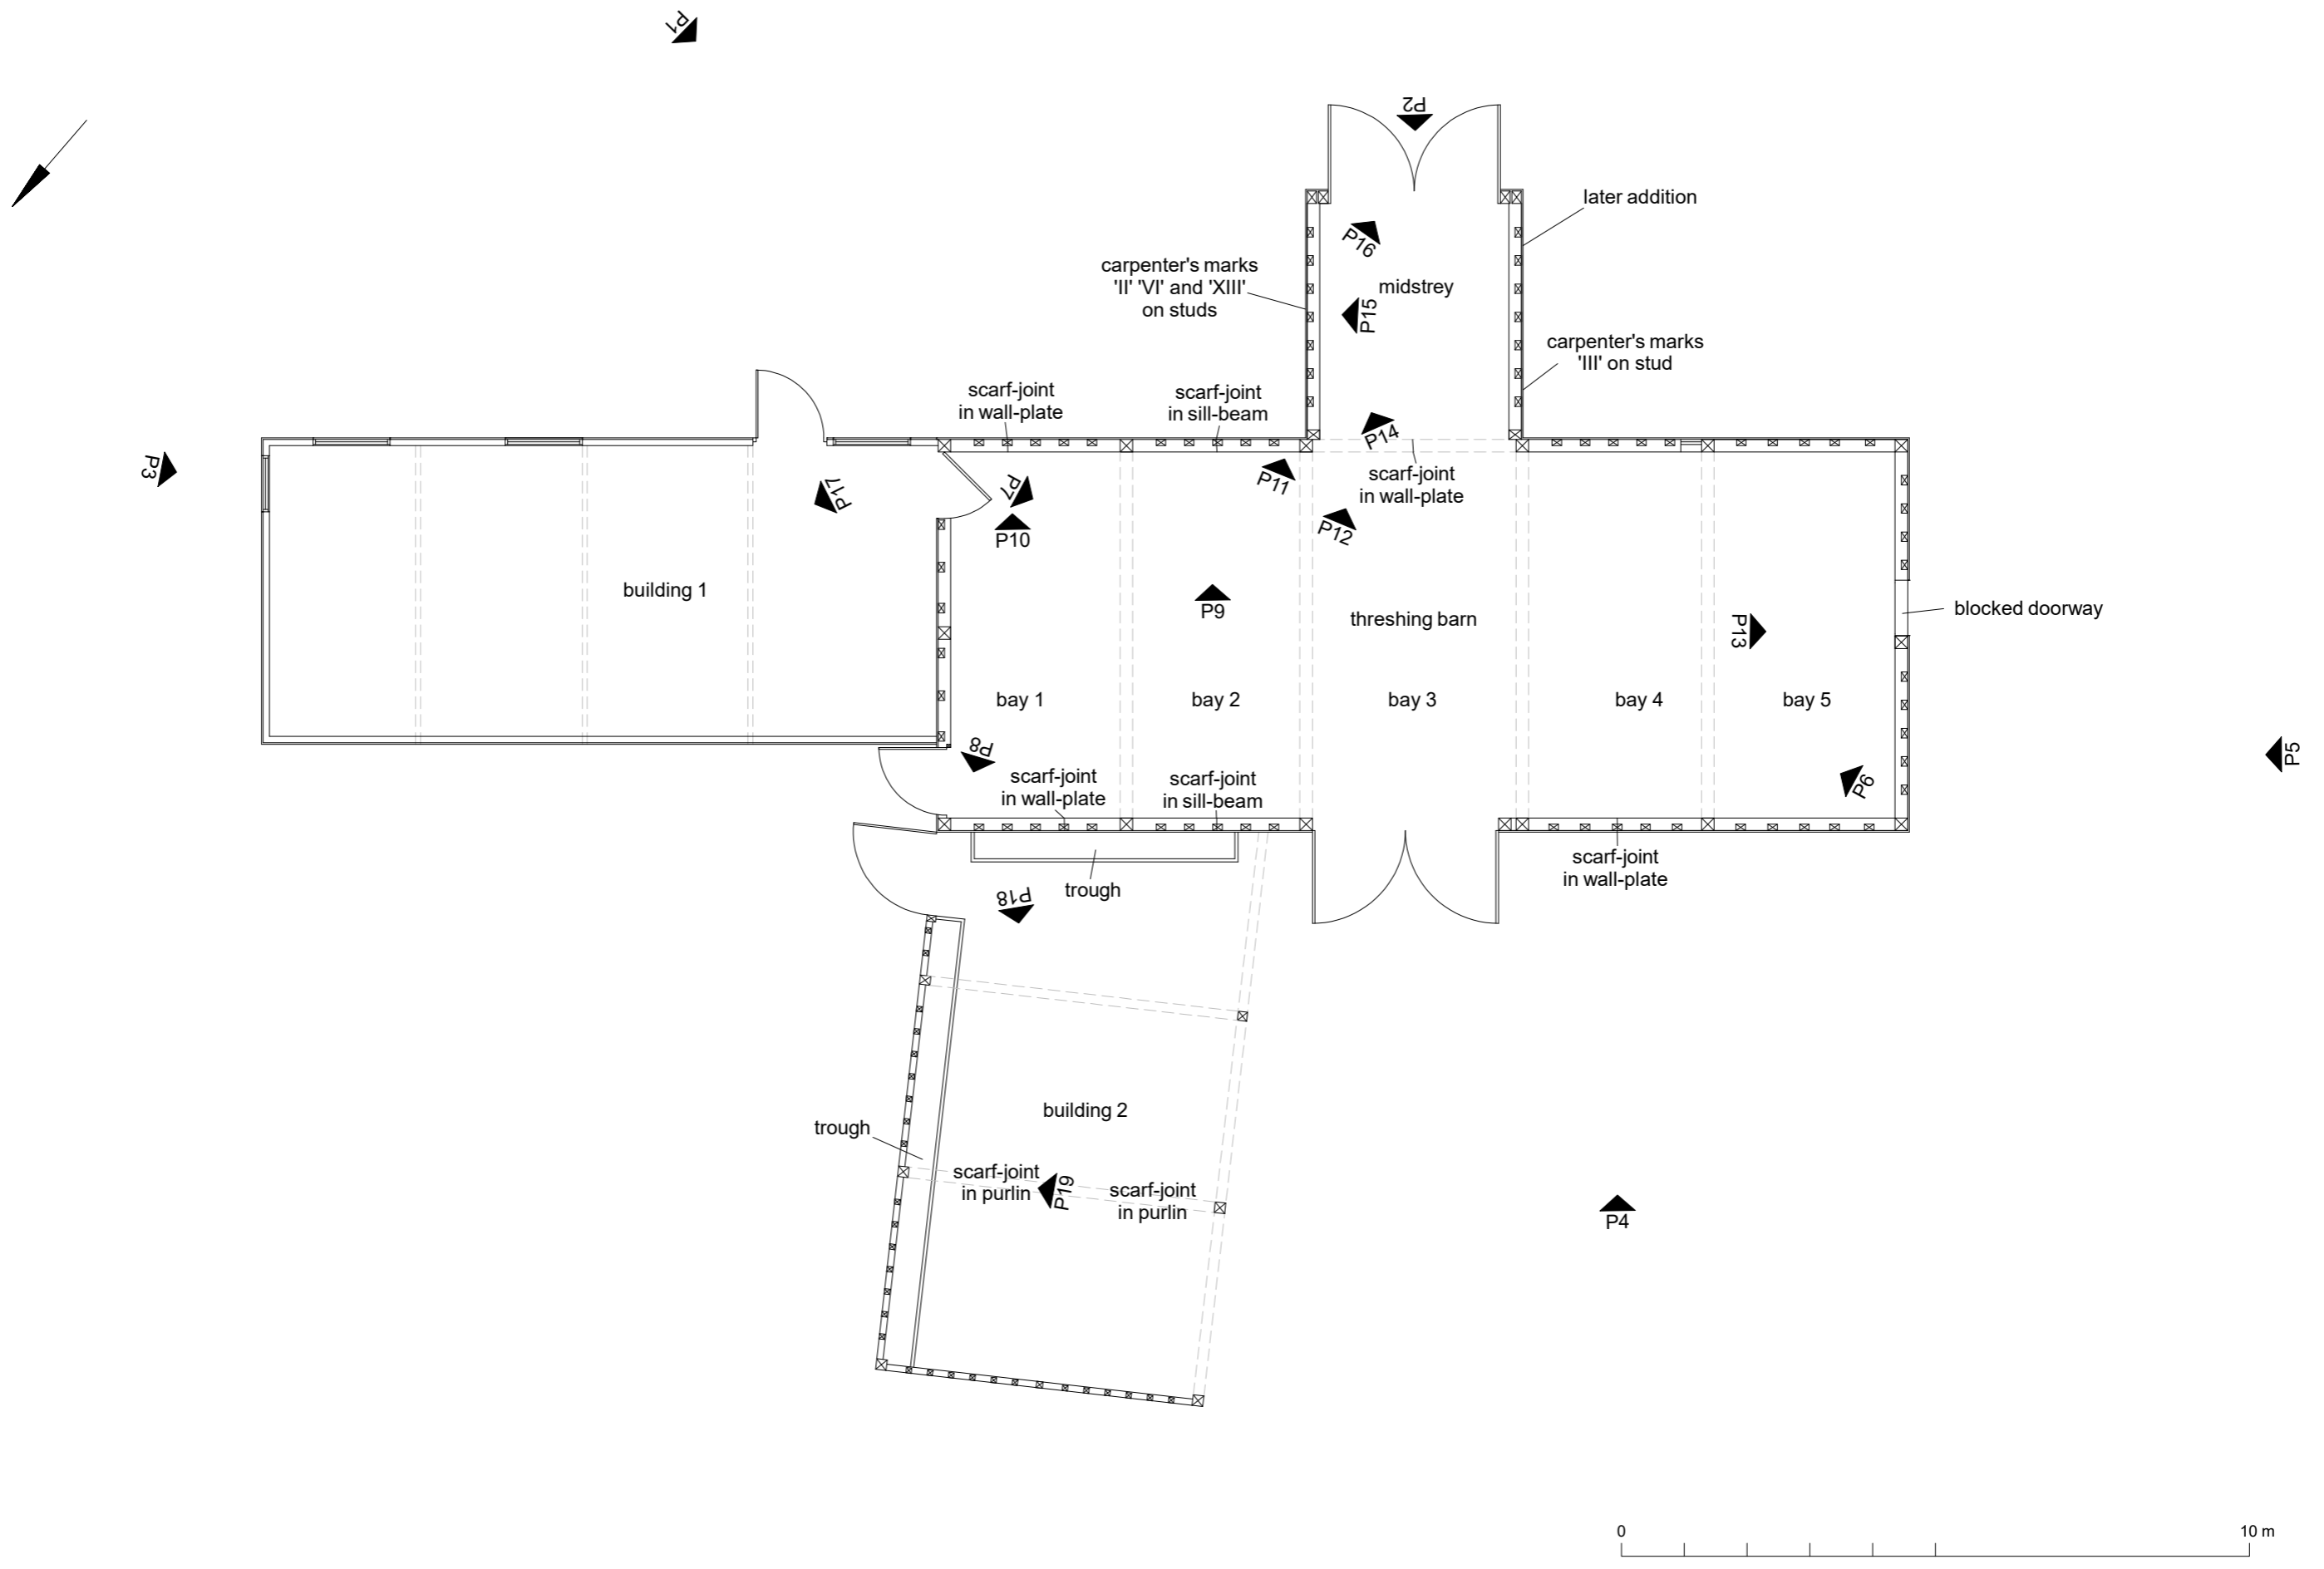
Bailey Barn floor plan. Location and direction of photographs reproduced in the text shown.
